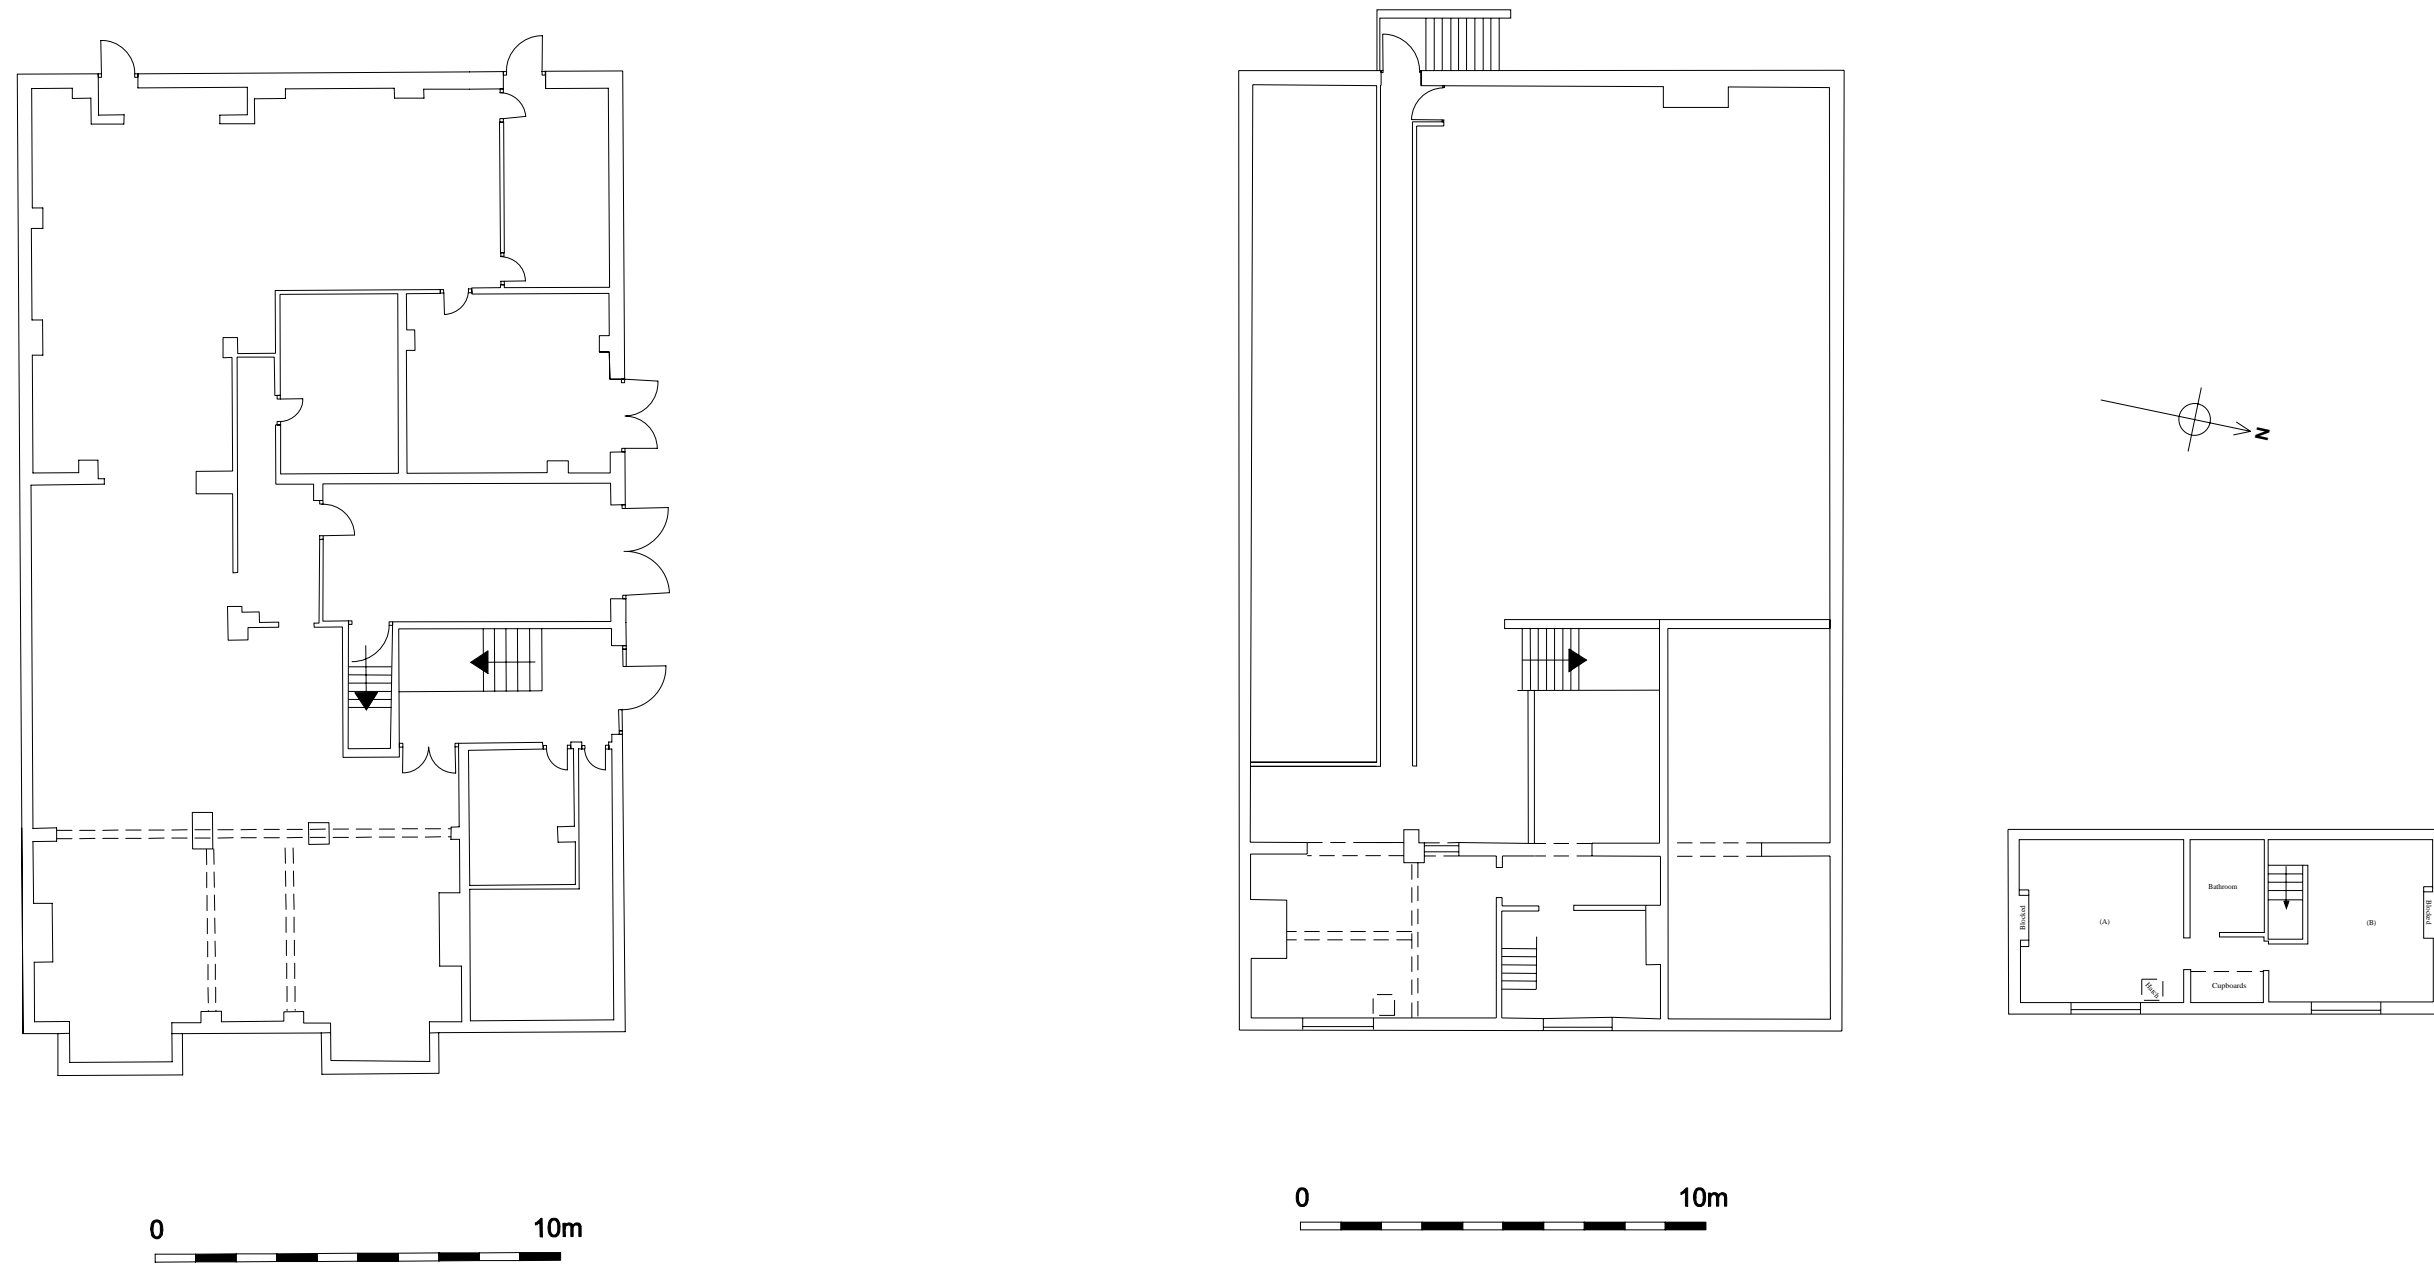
Building Plans (Left to Right) Ground Floor, First Floor & Second Floor.
